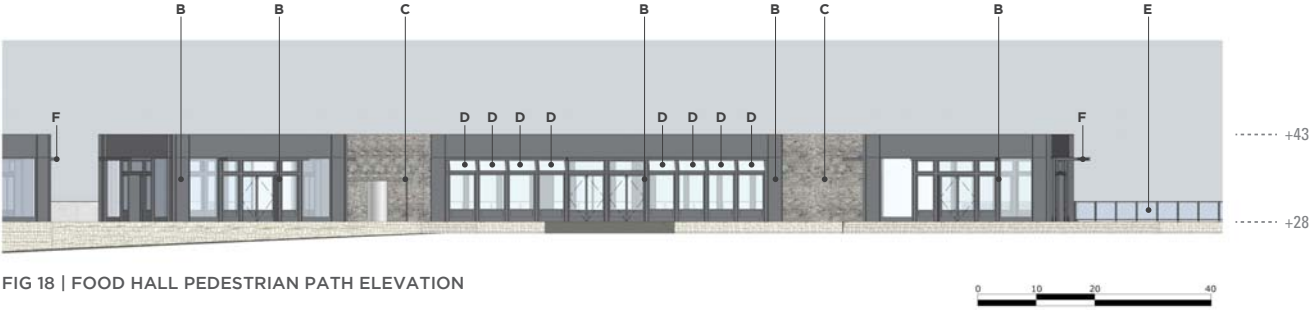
| FOOD HALL PEDESTRIAN PATH ELEVATION
